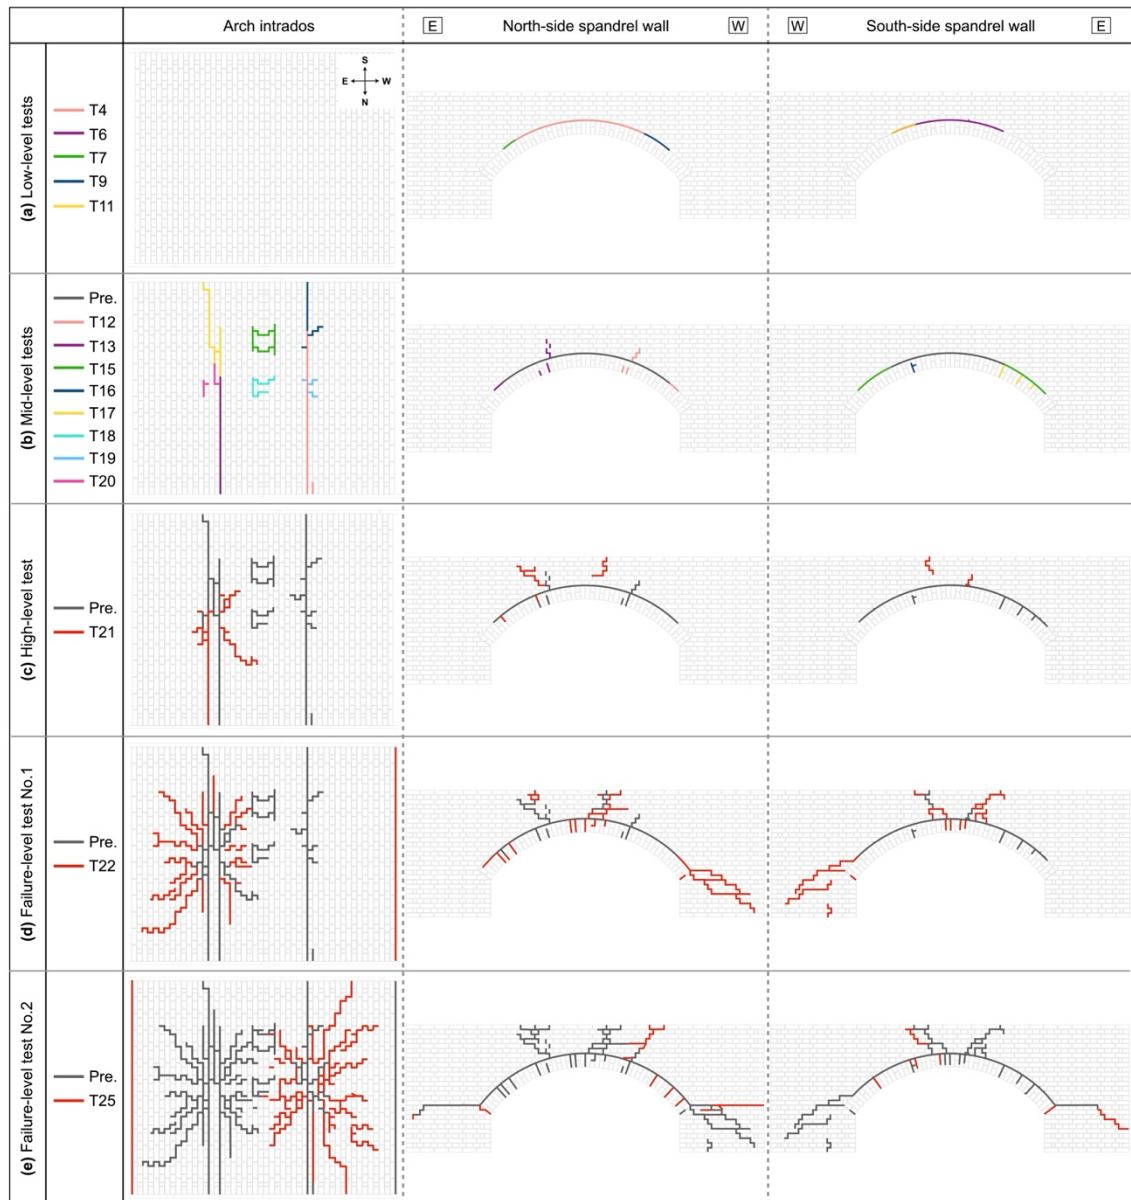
Crack evolution in the masonry arch bridge in (a) low-level loading tests; (b) mid-level loading tests; (c) high-level loading test; (d) the first and (e) the second failure-level loading test.
